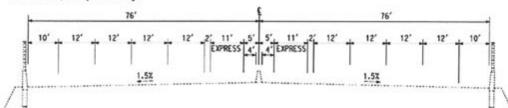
Proposed I-10 Cross Section in Tangent Sections
